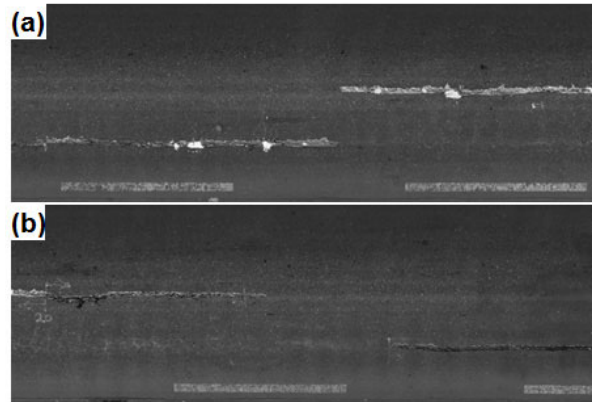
Pavement Surface Inspection (Bus-Only Lane)
